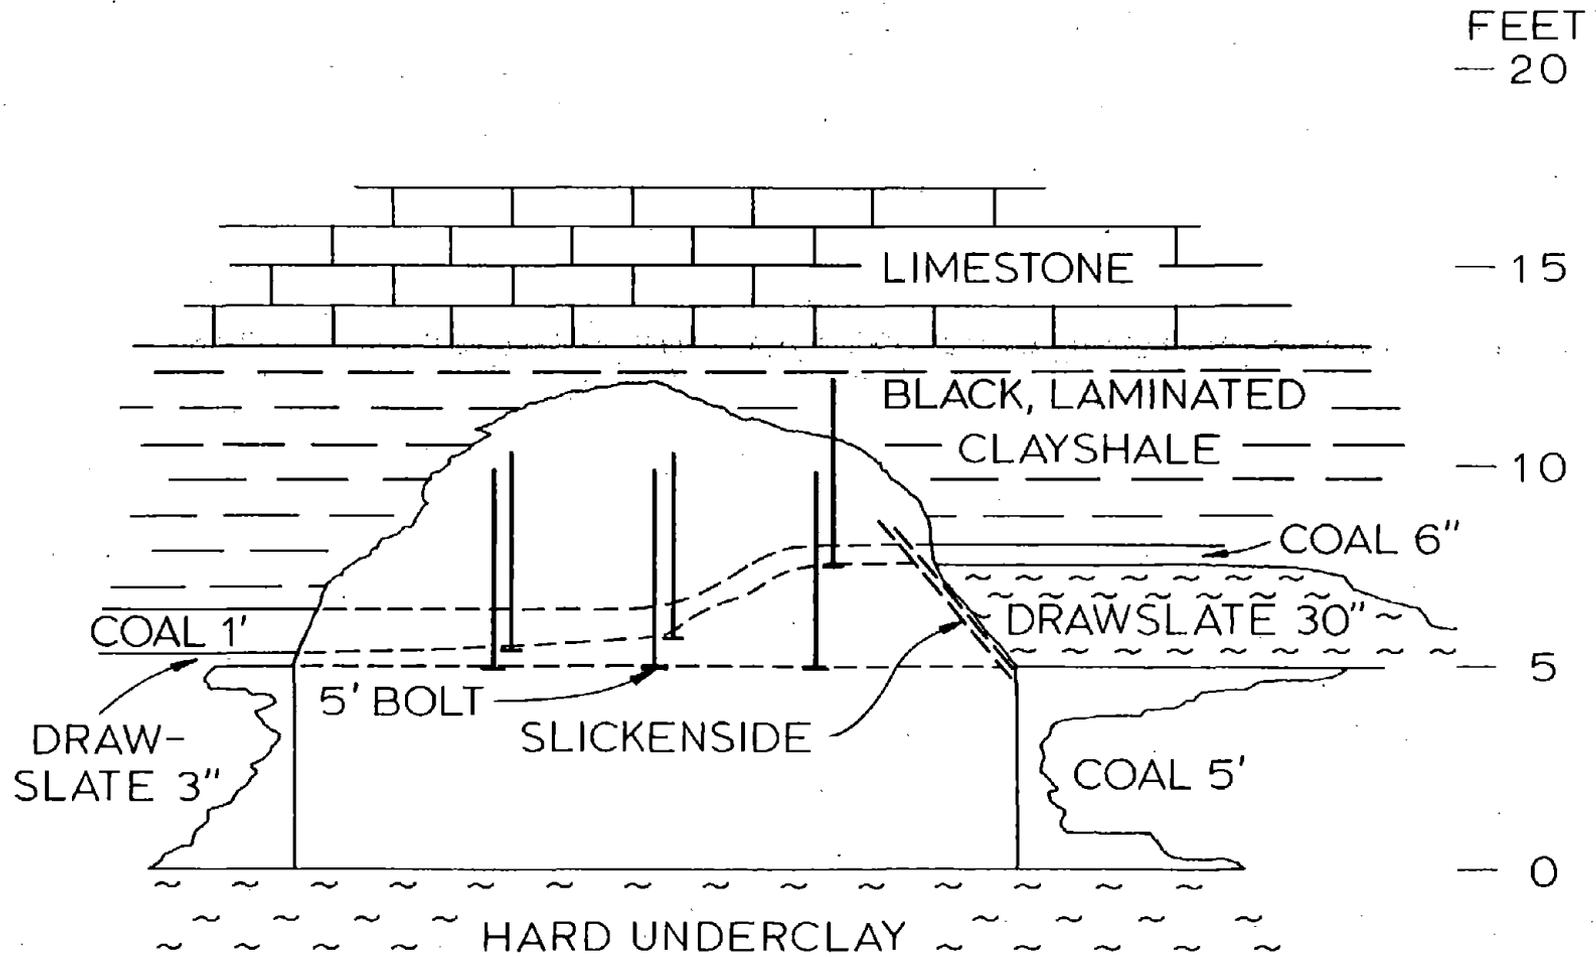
Cross Section of Roof Fall in Resin Bolted Test Area of a coal Mine [2.72]
